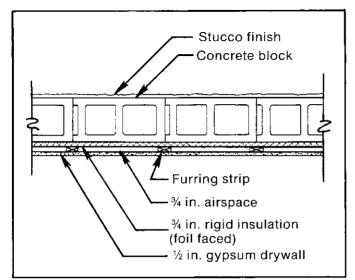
Plan View of Interior Radiant Barrier System as Applied to Concrete-Block Construction
